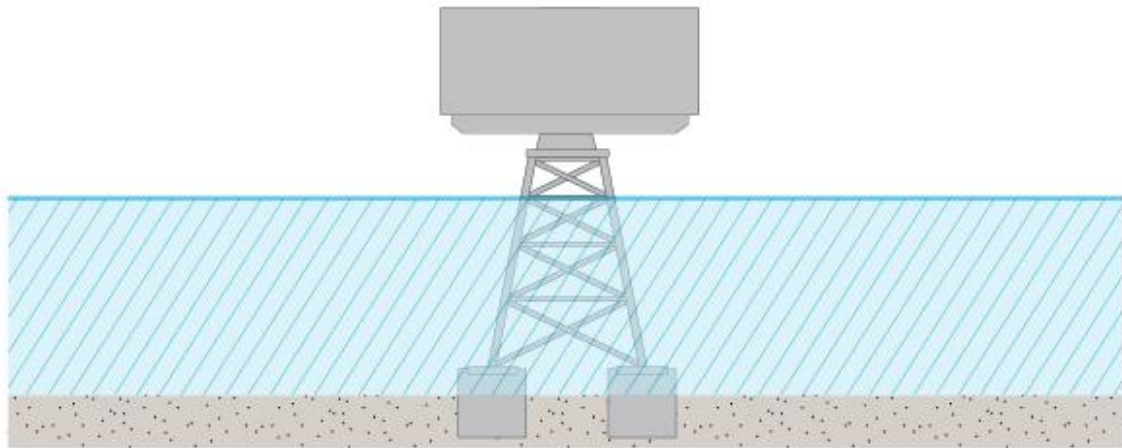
Schematic of a typical suction bucket jacket foundation (Offshore Substation Platform) (not to scale)
